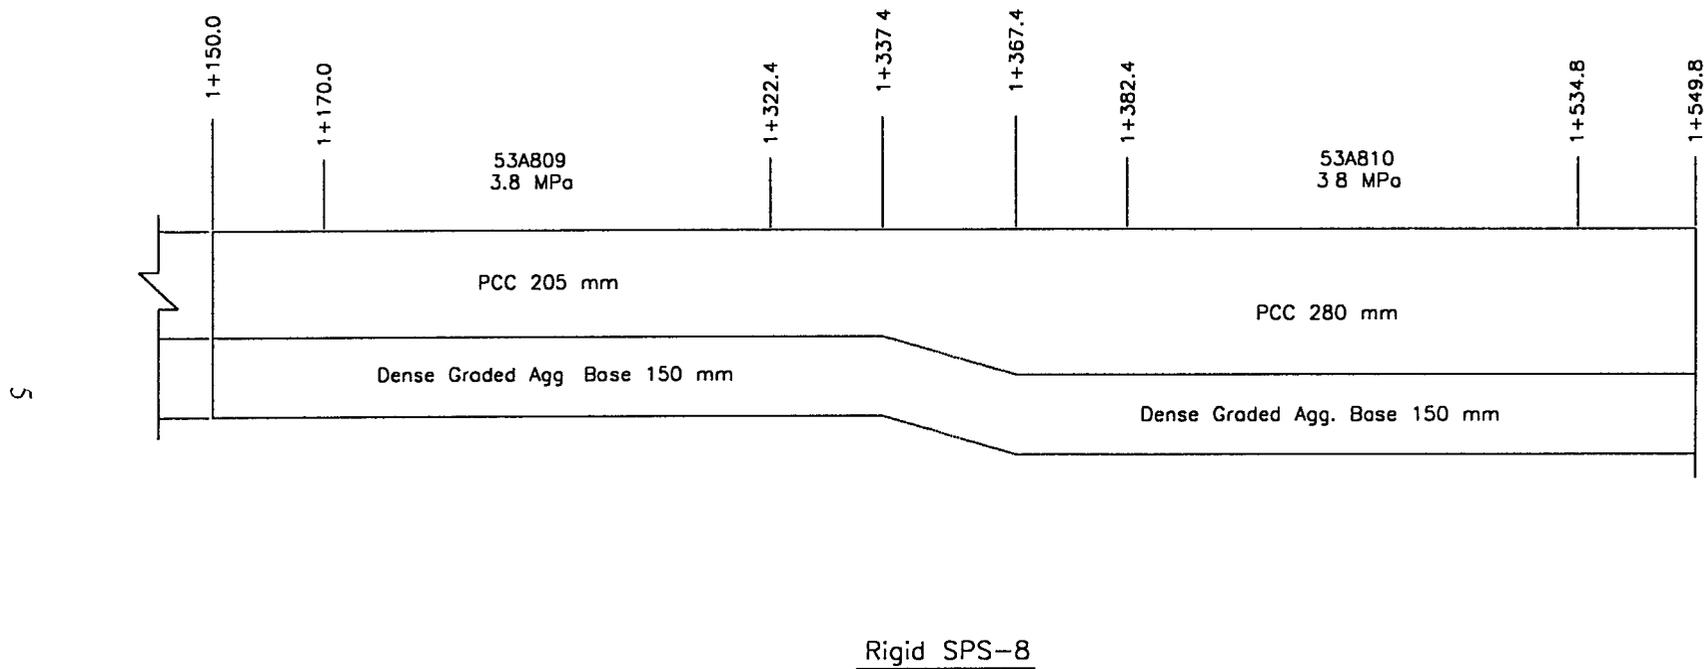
Layout of experimental test sections, Washington SPS-8 project
